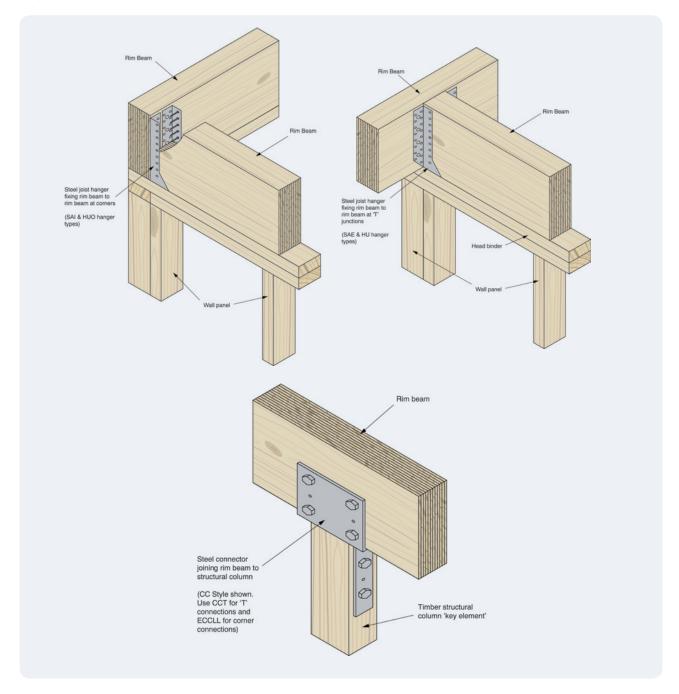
Ring beam connections (from WoodSolutions Technical Design Guide #39 Robustness in Structures).
